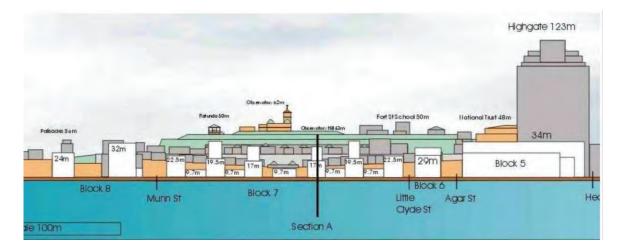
ACTUAL DIMENSIONS OF THE BUILT FORM OF CENTRAL BARANGAROO BARANGAROO MASTERPLAN BLOCK ENVELOPES WEST ELEVATION
